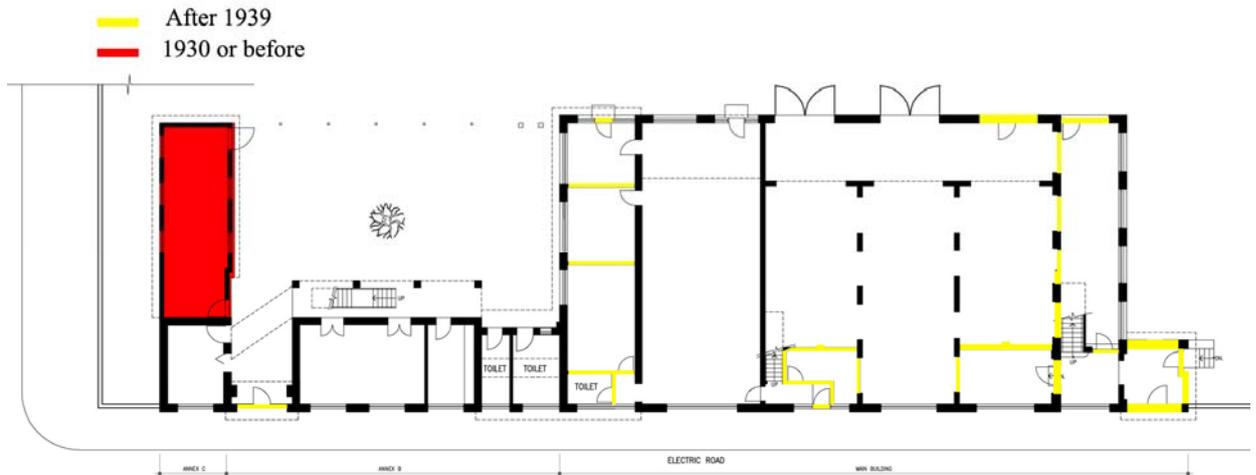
Possible ground floor plan of the former clubhouse at No. 12 Oil Street before the 1969-1975 conversion.
